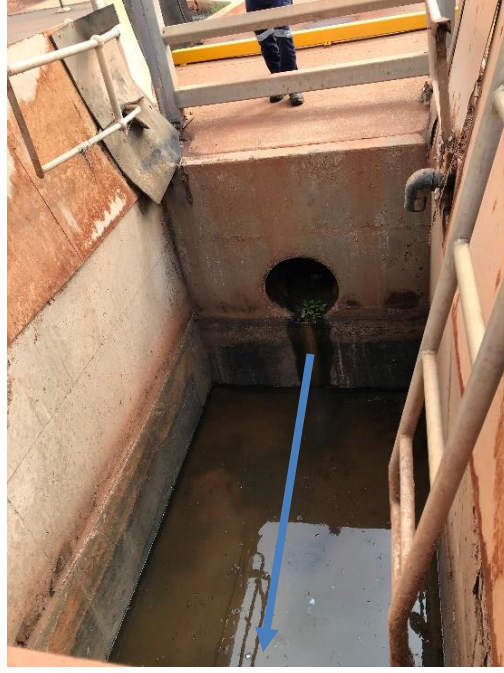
Existing liquid waste discharge pit. Dispose of ladder. Visible pipe to be excavated and disposed.
